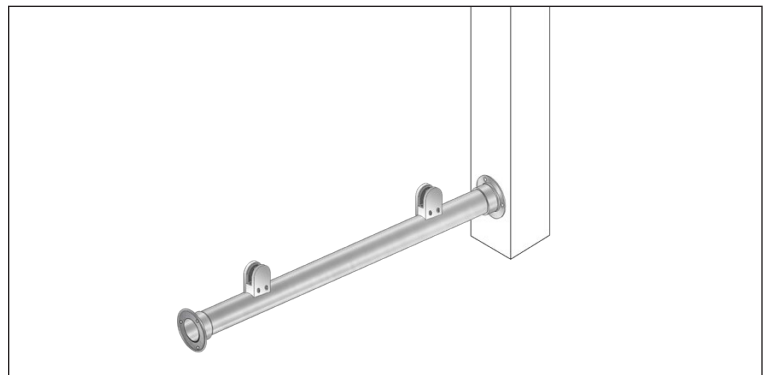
Figure C. Position the sidemount fittings on the rail with the flange facing outward and the Glass Panel Connectors pointing upward.
